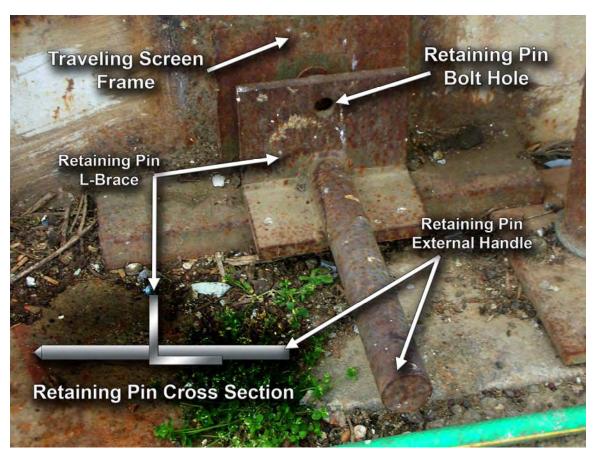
Close-up image of the retaining pin assembly and cross-section of retaining pin (lower left). The retaining pin bolt is not shown. There are retaining pins on the north and south base of the Debris Removal System (DRS) where the Traveling Screen frame is located.
